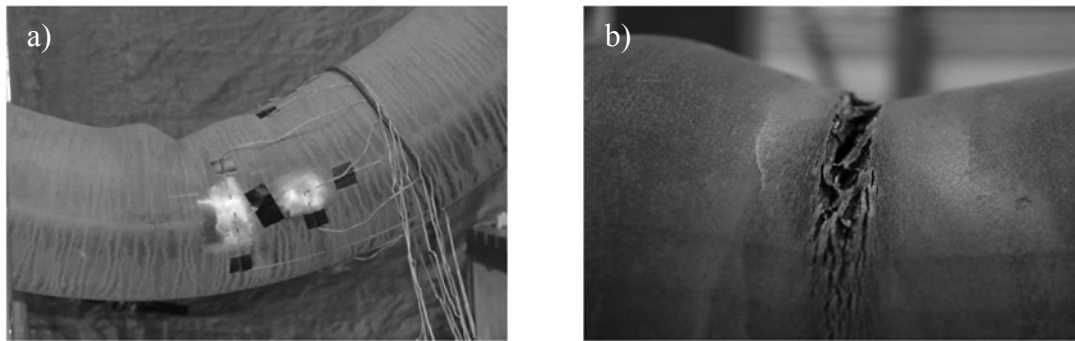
Failure aspect of SP2 specimen: a) buckle detail; b) detail of the crack at the end of the test.
